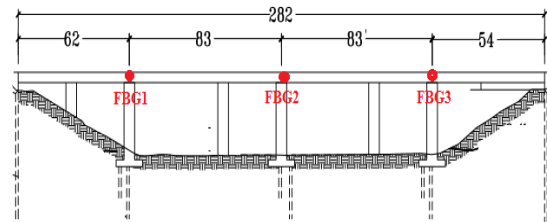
Deployed FBG sensor network on the Brown Road Bridge.
